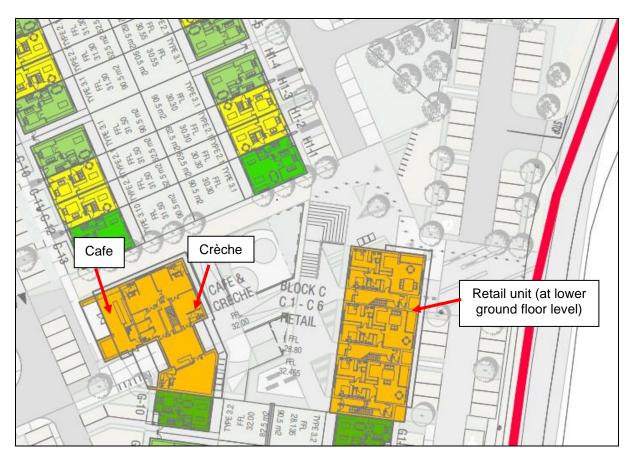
Plan excerpt showing the proposed neighbourhood centre and associated parking spaces
